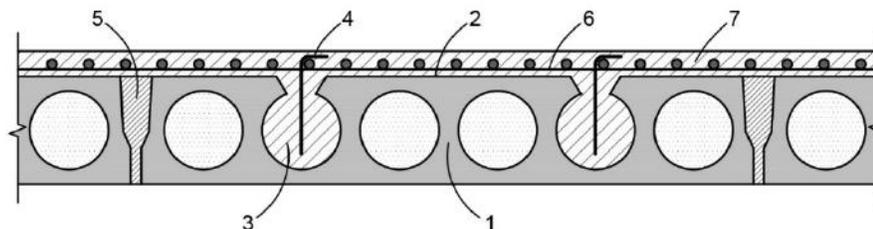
Retrofitting of hollow core RC slab with concrete topping: 1- existing slab; 2- removal of existing topping and roughening of the interface; 3- slits cut in the selected hollow cores along the slab length filled with concrete; 4- L-shaped steel bars embedded in the selected hollow cores; 5- re-grouted joints between the hollow core planks (as needed); 6- steel mesh reinforcement; 7- concrete topping.
